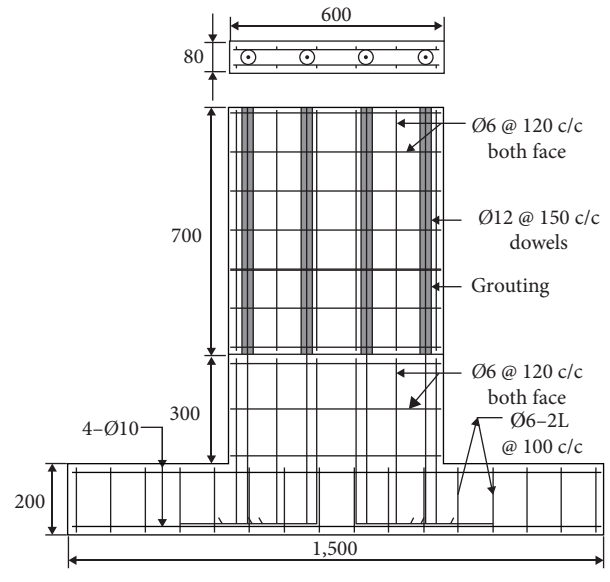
Precast wall panel—intermediate 1 (PW11).
